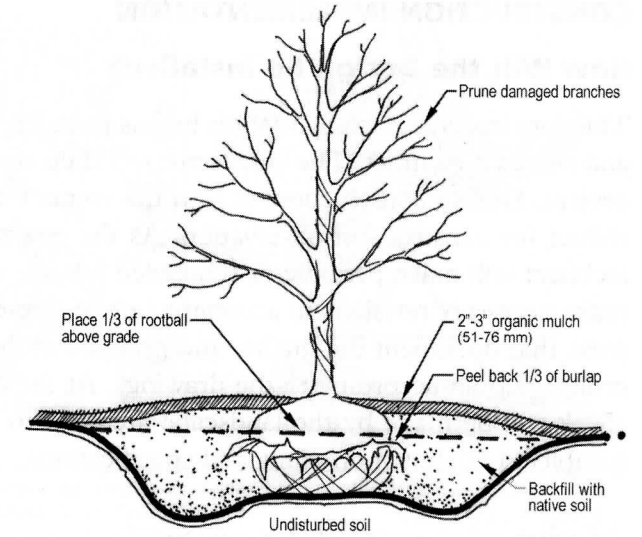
Tree planting detail. (COURTESY OF ELLIOT BUFF AND ALBERT LYNN.)
